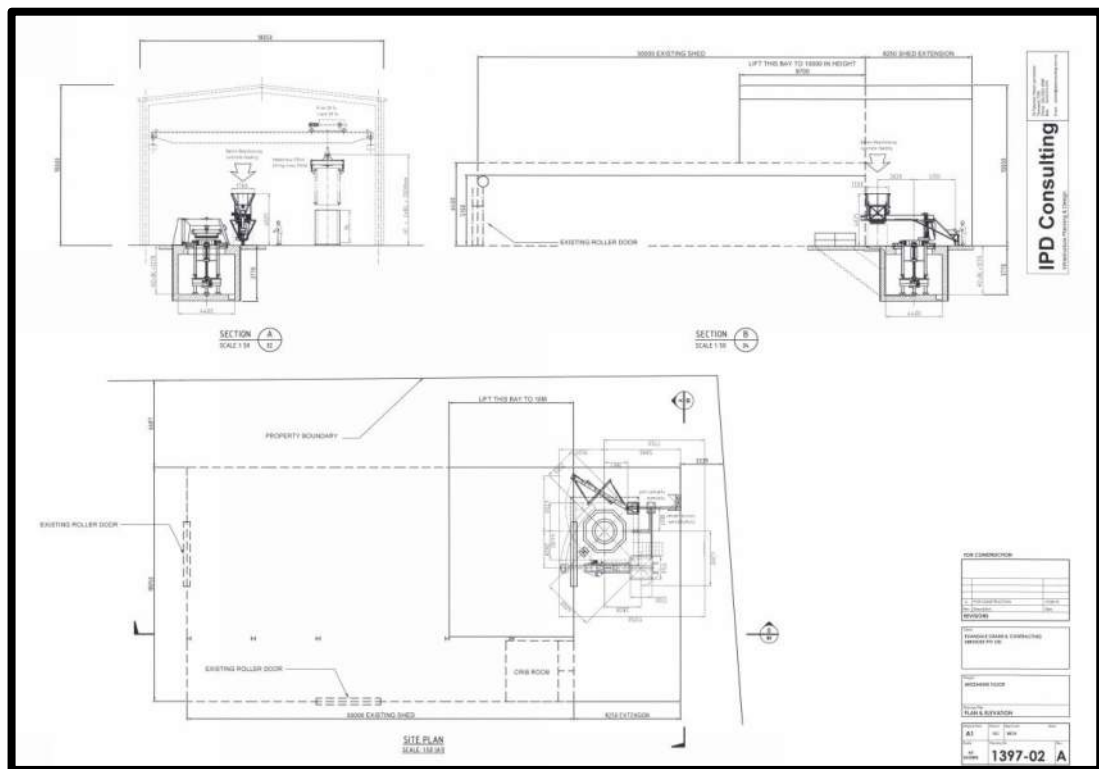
Proposed floor plan and elevations (IPD Consulting, 2017)
